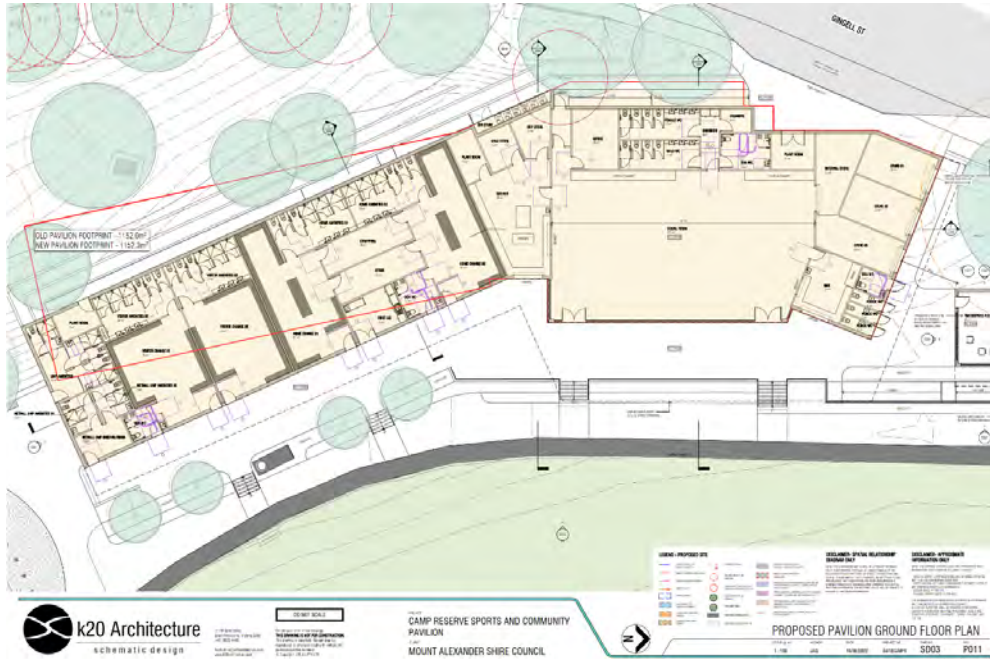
Revised proposed floor plan of the pavilion. (Source: K20 Architecture March 2025)
